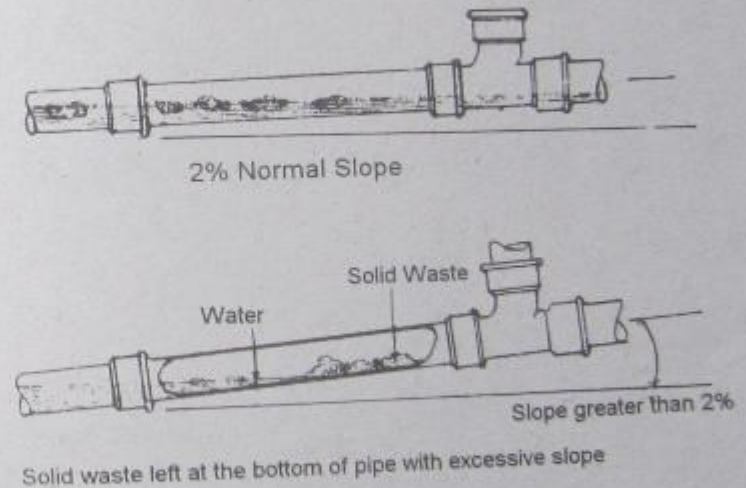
THE PROPER AND IMPROPER SLOPE OF HOUSE DRAIN
